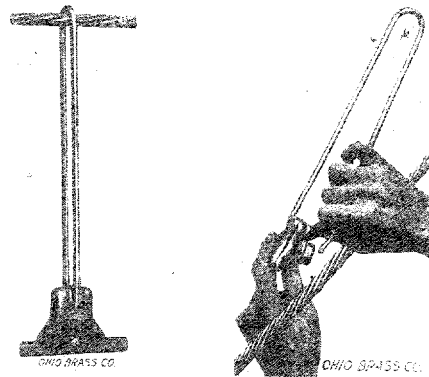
Catenary Hanger. View at Right Shows Hanger Being Installed on Messenger Wire.
